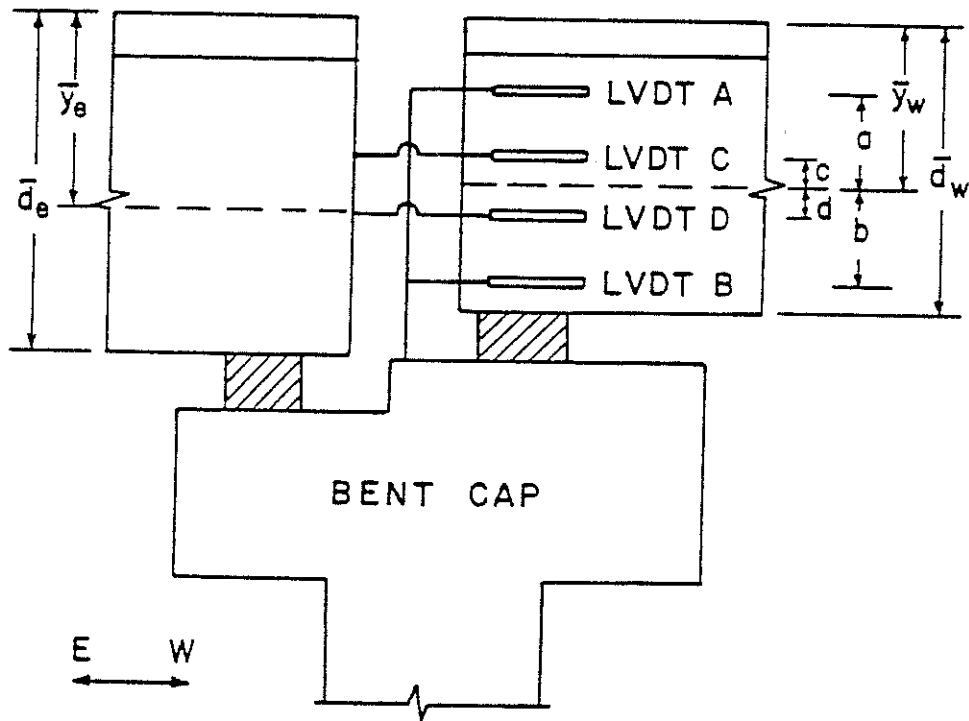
North Elevation of a Typical Expansion Joint Showing Measured Positions of LVDT's.
